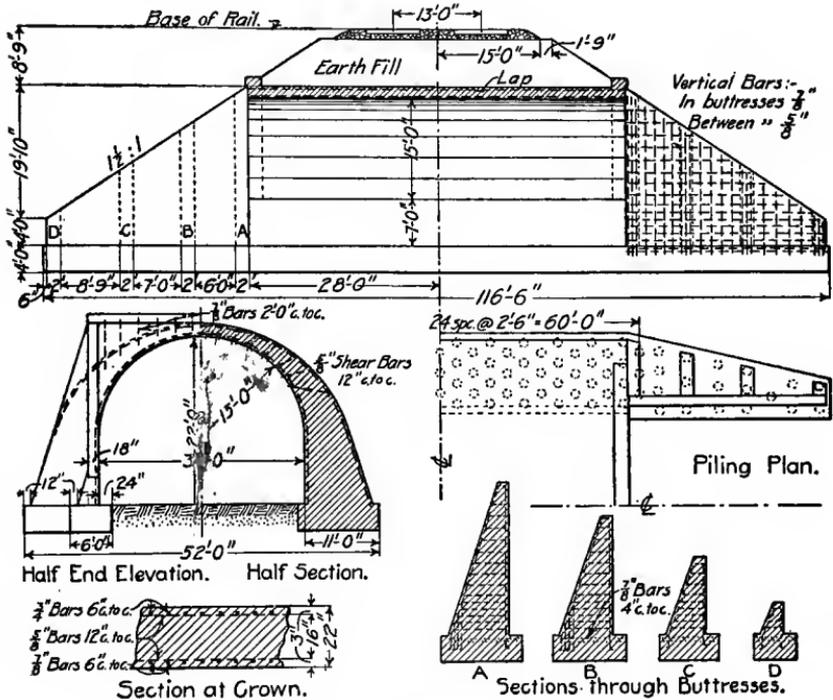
REINFORCED CONCRETE ARCH ON UNION PACIFIC R.R.
